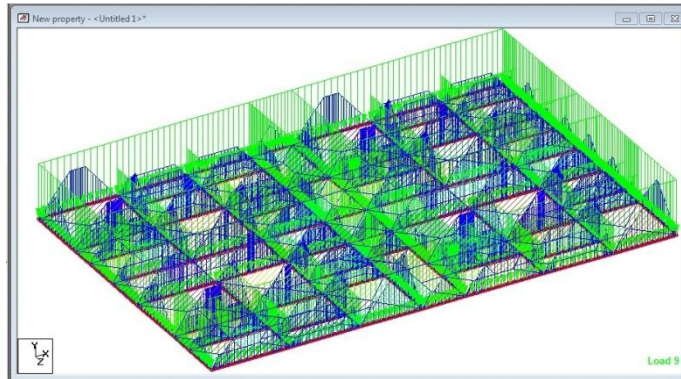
Dead Loads Udl Showing On Inner Walls
